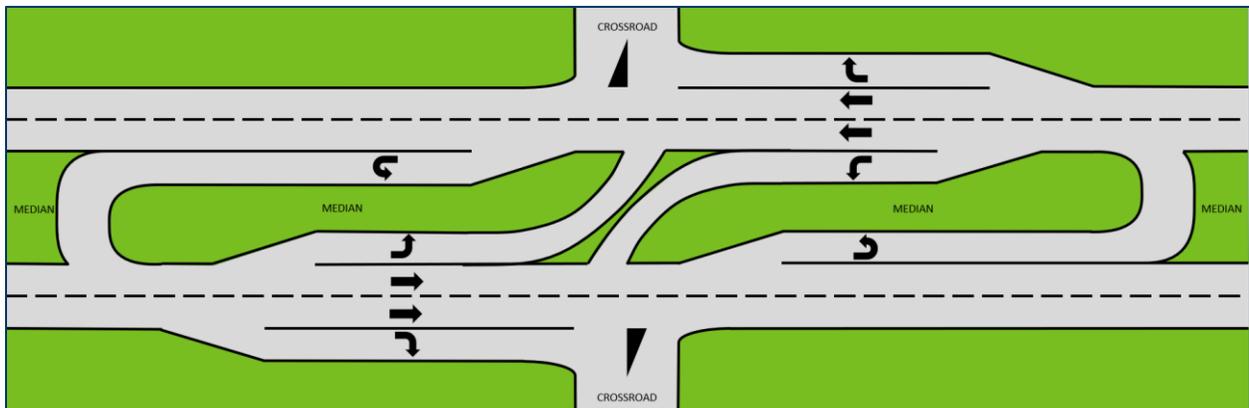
Standard At-Grade Expressway Intersection Layout
